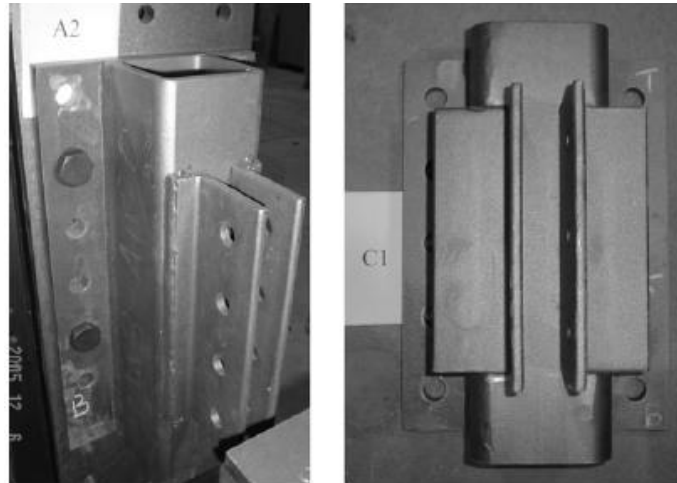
Double-angle shear connection with small hollow structural section column (Gong, 2008)
